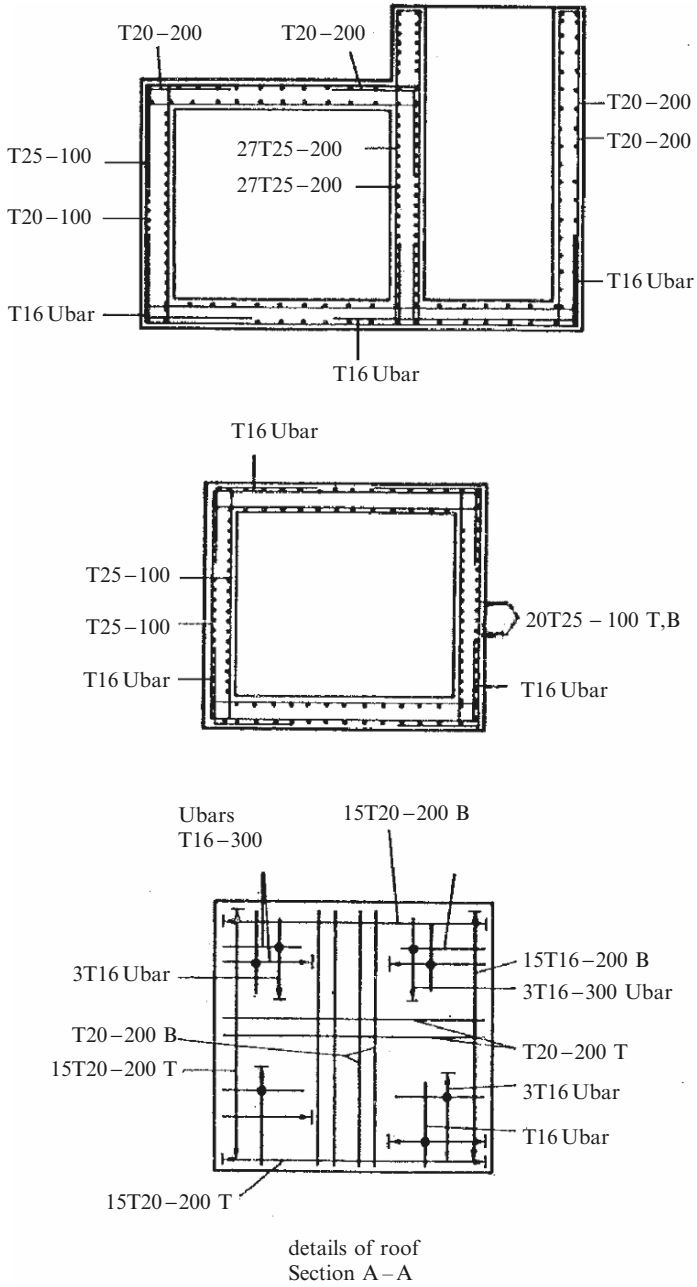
Domestic nuclear shelter (reinforced concrete): detail
